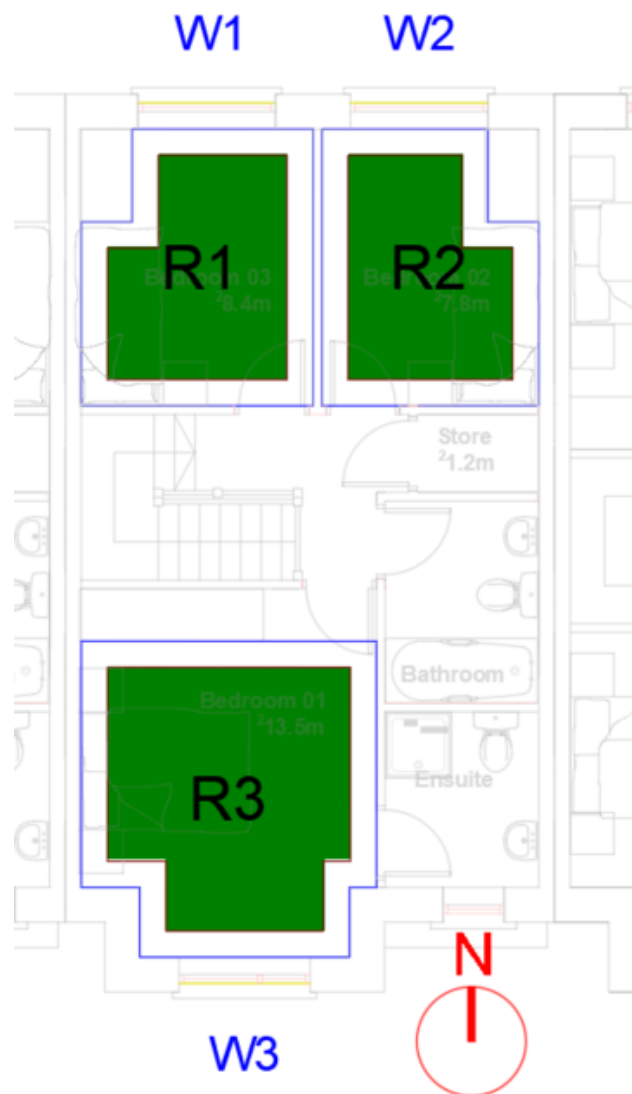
Proposed First Floor sDA Contours of House E-03 3-073
